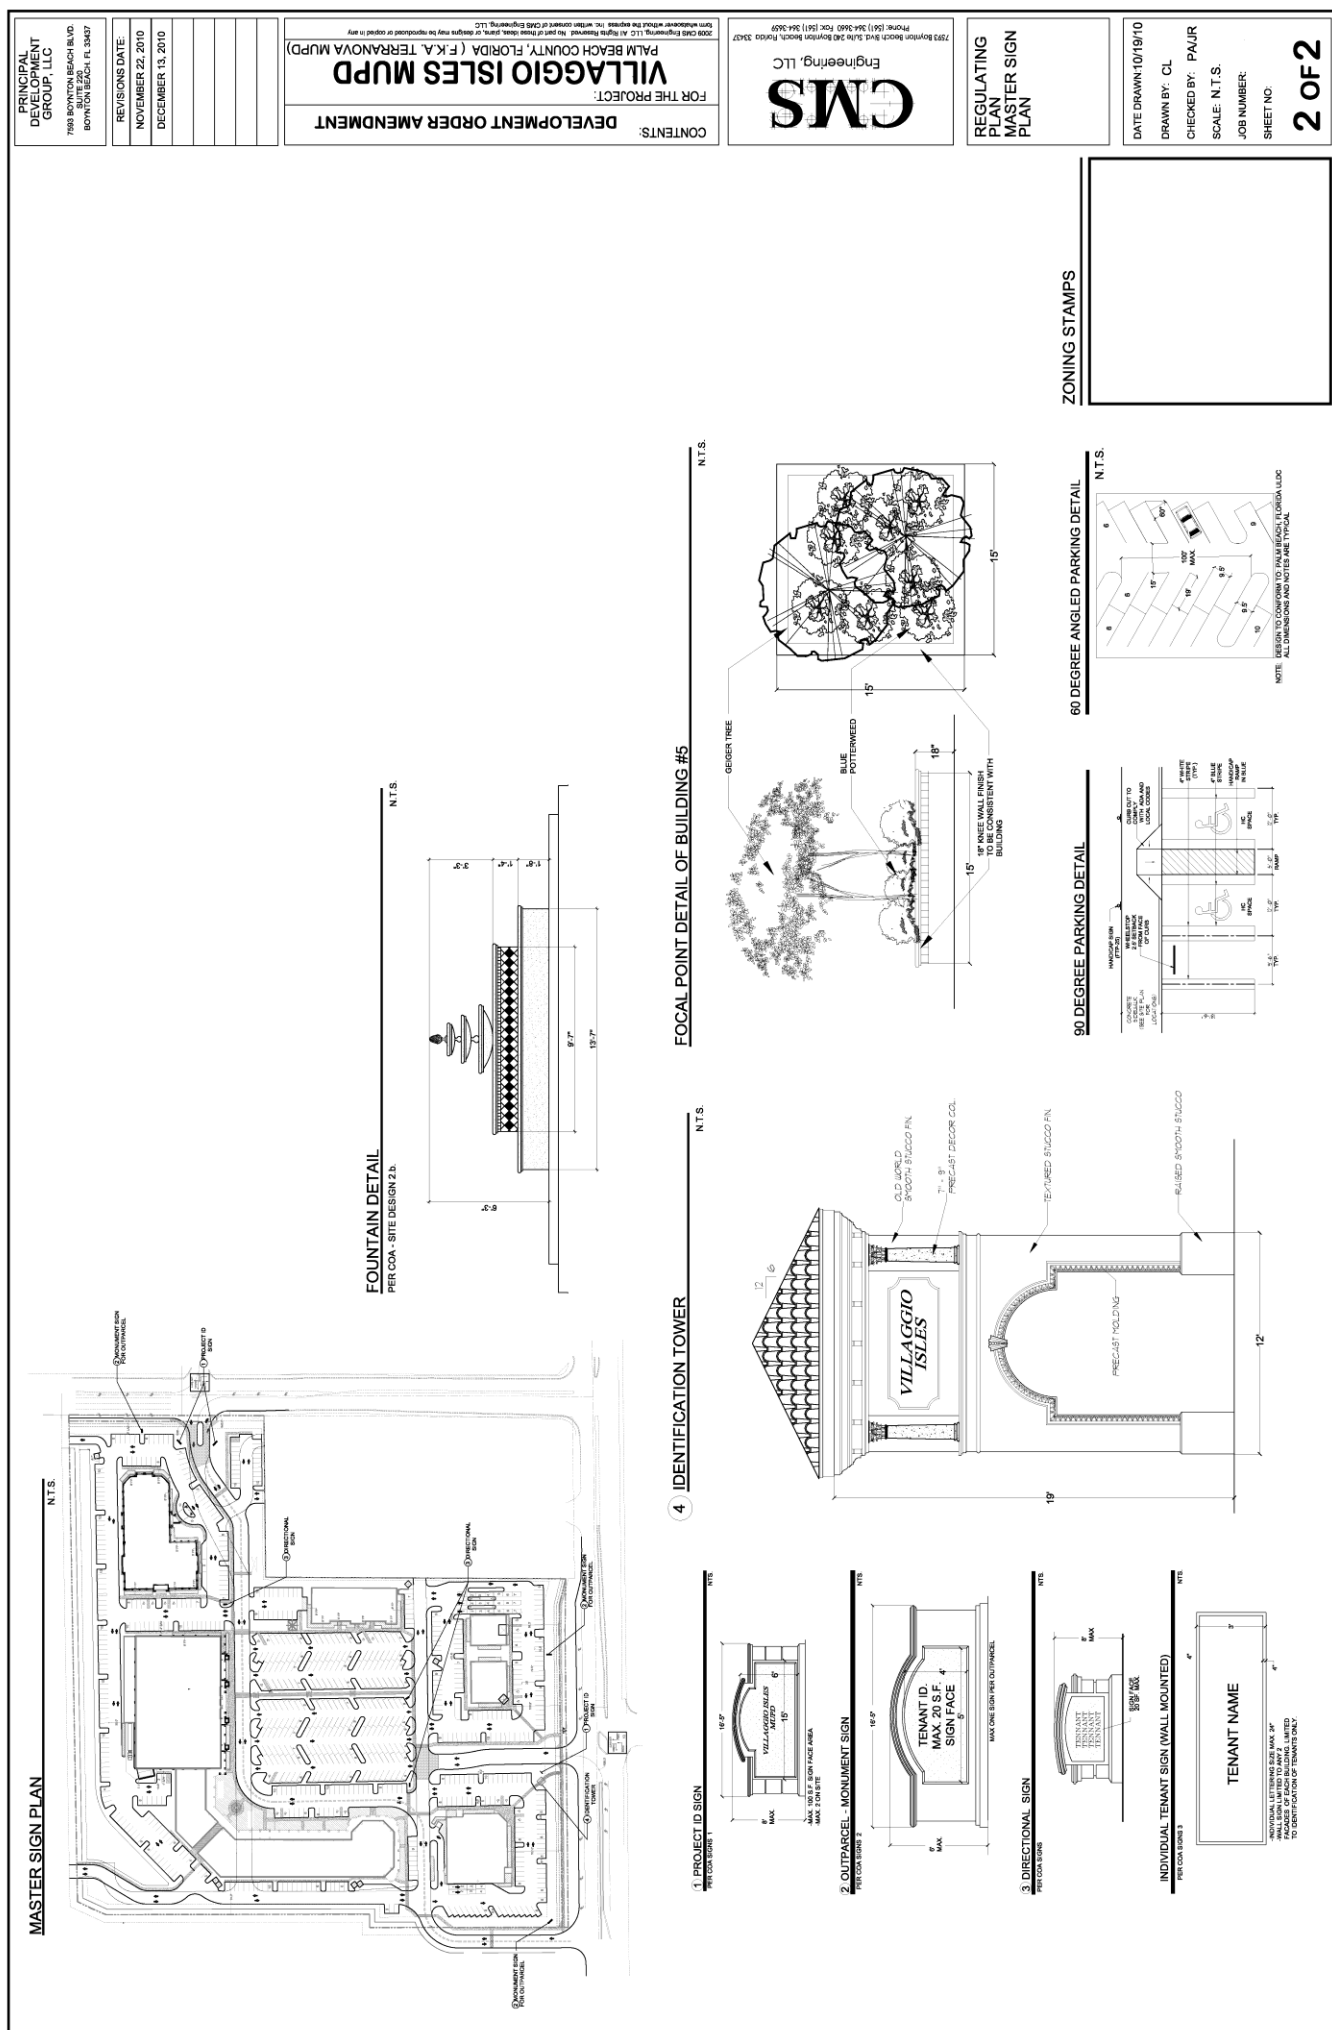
Preliminary Regulating Plan dated December 13, 2010
